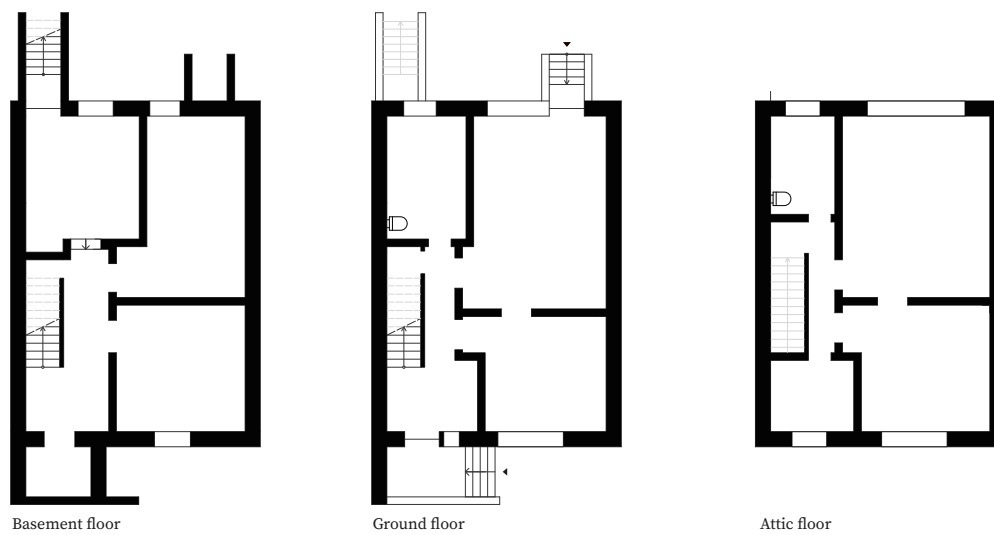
Plan of single-family house, Römerstadt - 1:200
